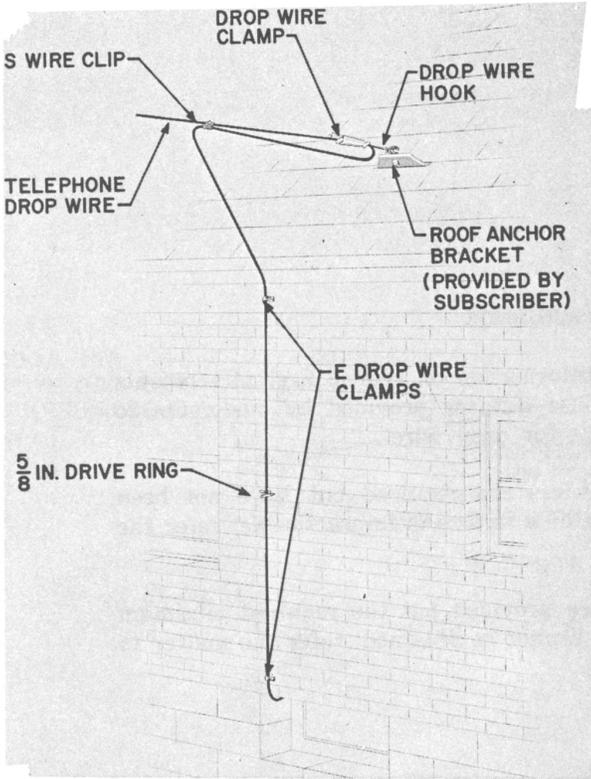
Drop Wire Attached to Roof Anchor Bracket
